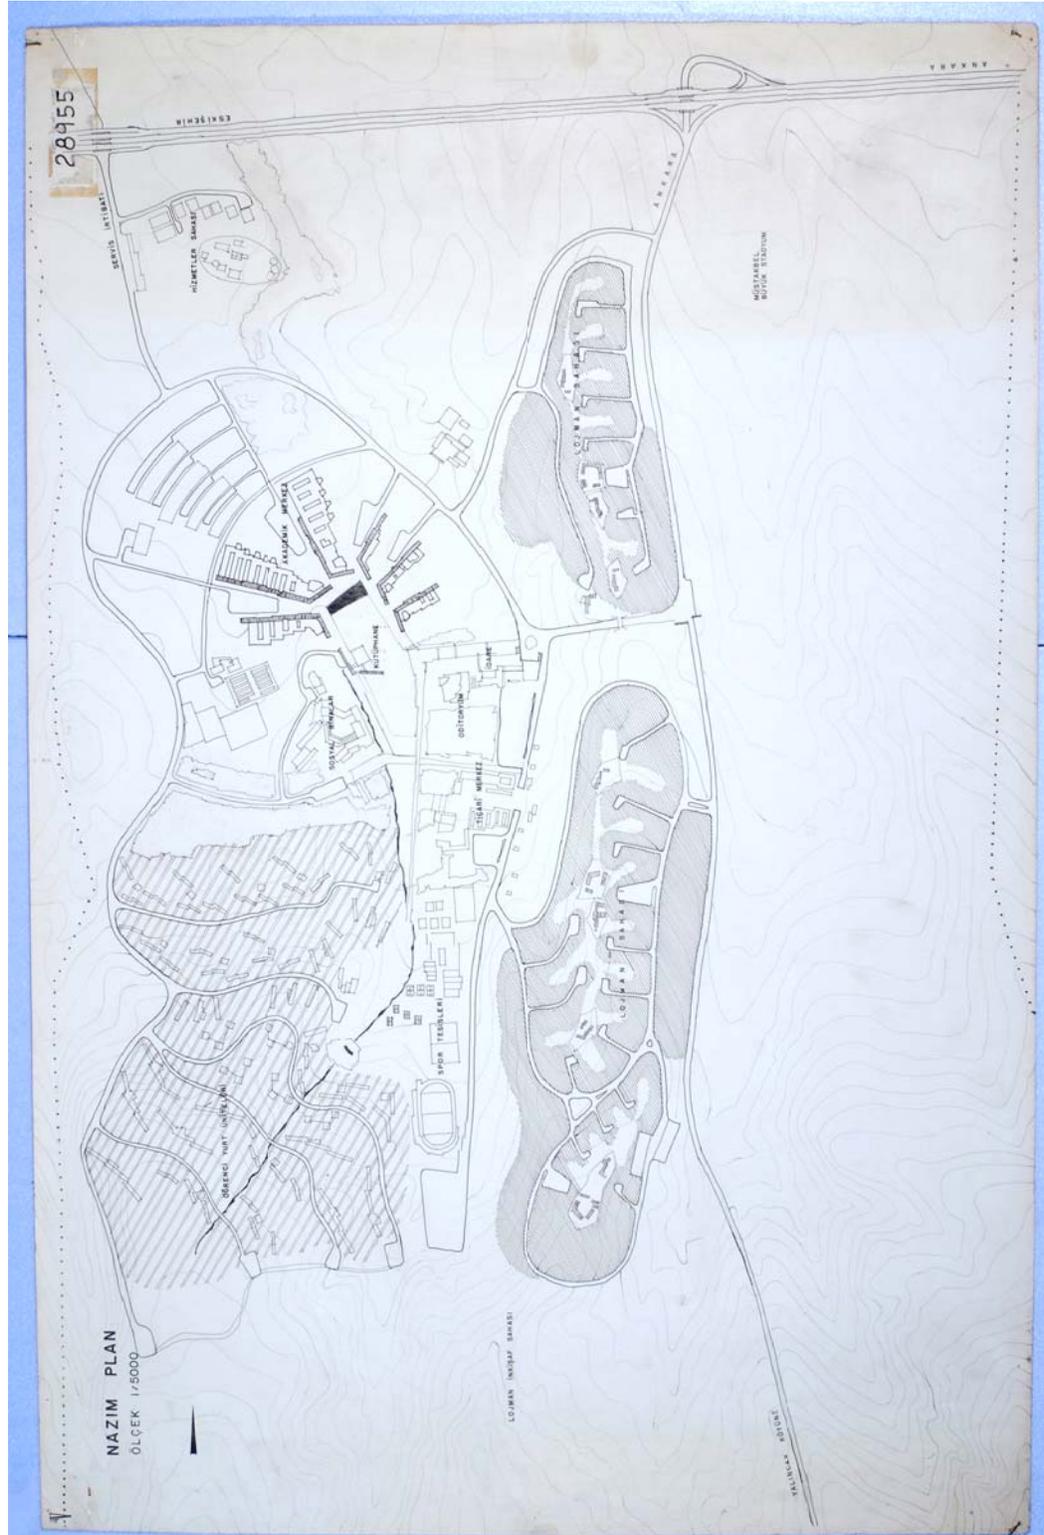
Site plan; Second Place Winner (project no. 18); Second Competition, Esat Turak, Gürol Gürkan, Önder Sonad, Aktan Yörükoğlu, Osman Armangil (Source: Çinici office archives).
